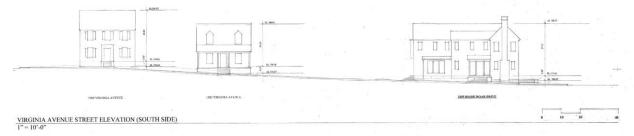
Virginia Avenue Streetscape (Proposed Dwelling on Right)
